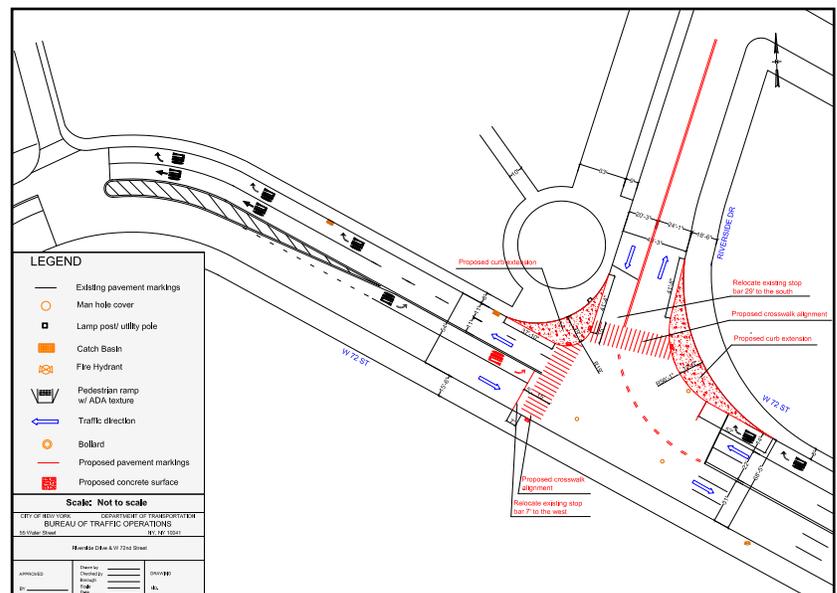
Proposed Condition - Riverside Drive & West 72nd Street
